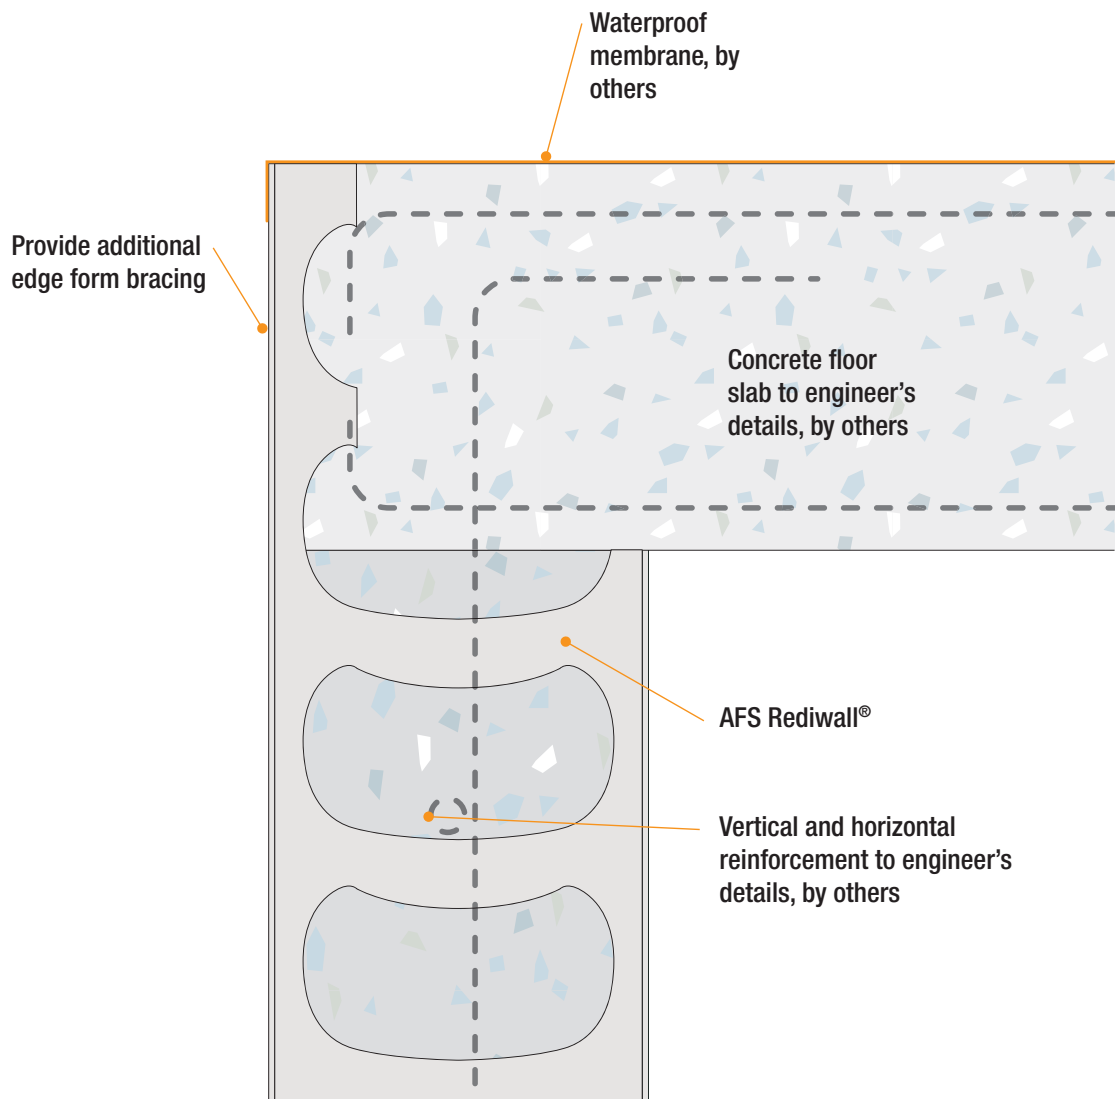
External Wall/Slab Junction at Typical Raft Slab Above Ground
